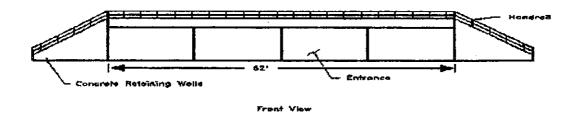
Used Oil Storage Facility, Building 7651.
